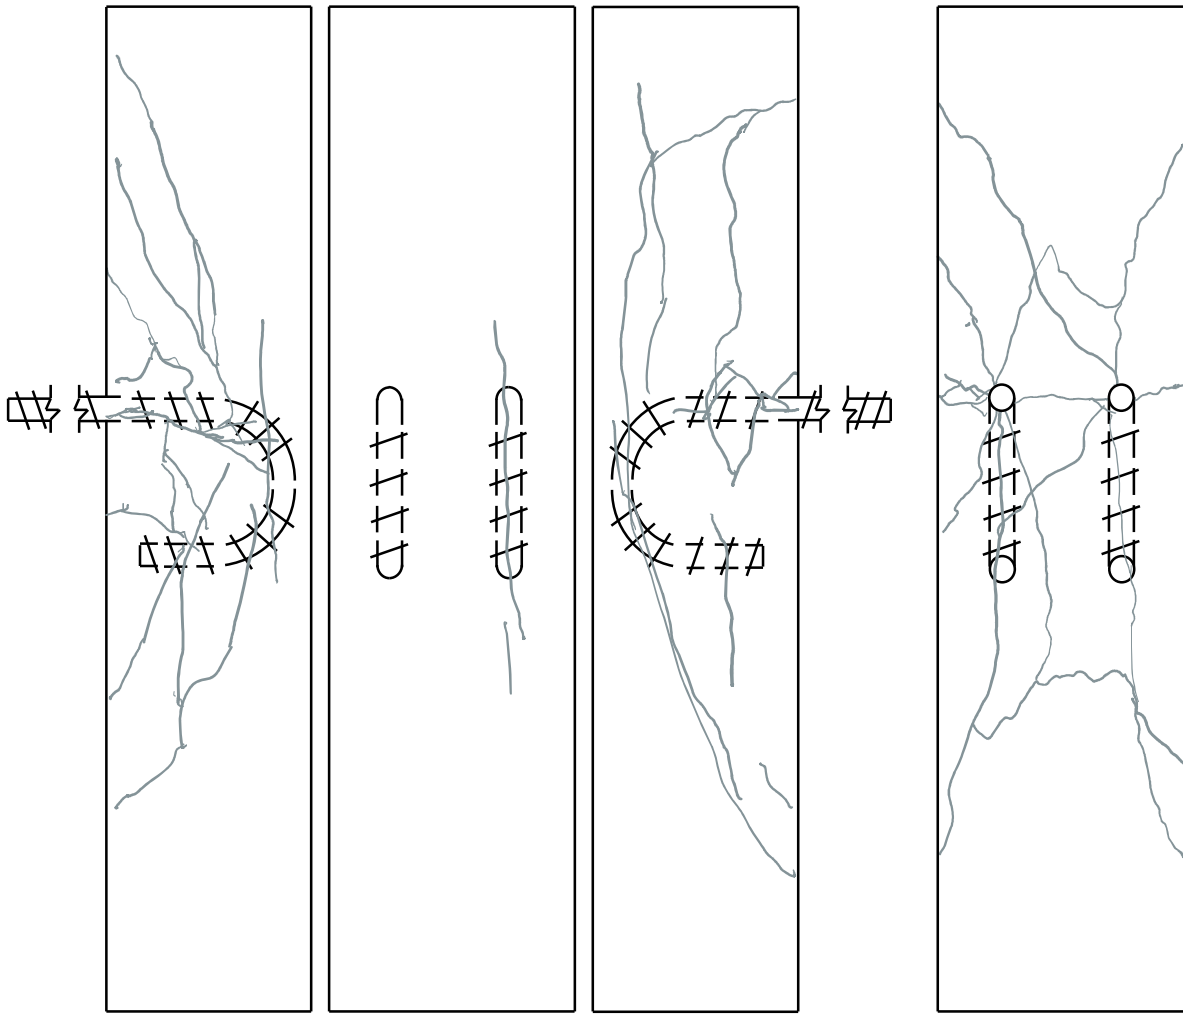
Crack pattern at maximum normalized tensile load for beam-column joint specimen MD2-180: (a) west side face, (b) back face, (c) east side face, and (d) front face
